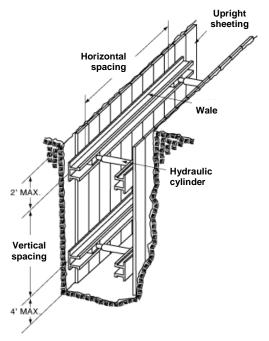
Typical aluminum hydraulic shoring: waler system
